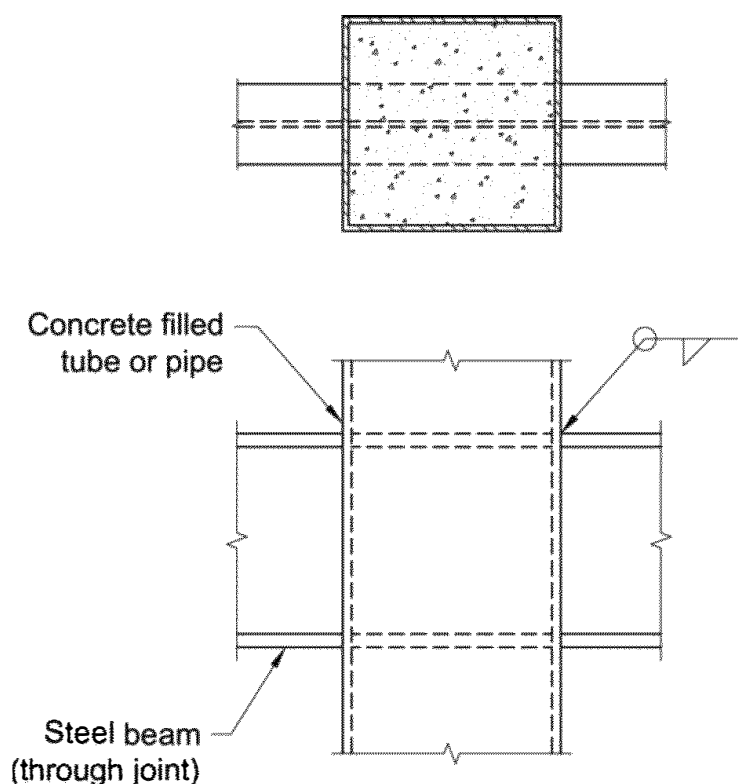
Filled composite column-to-steel beam moment connection (beam flange uninterrupted).
